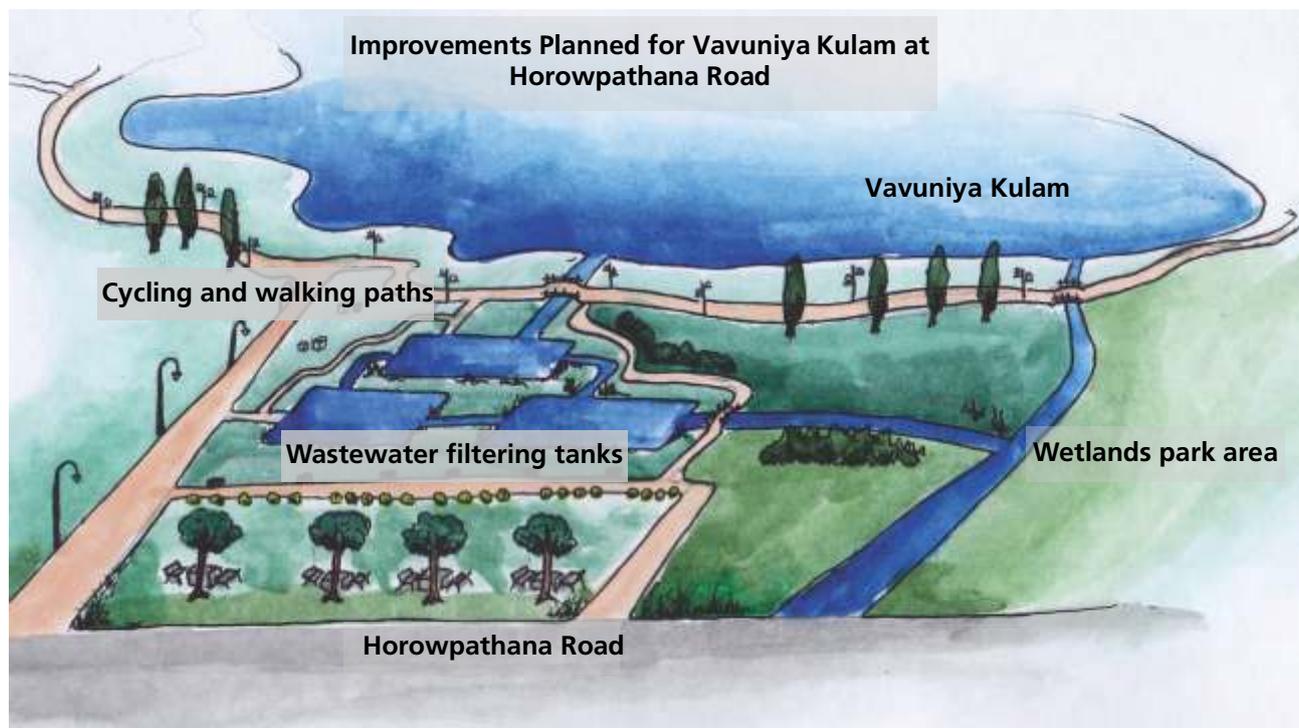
Layout Plan of Improvements to Vavuniya Kulam off Horowpathana Road
